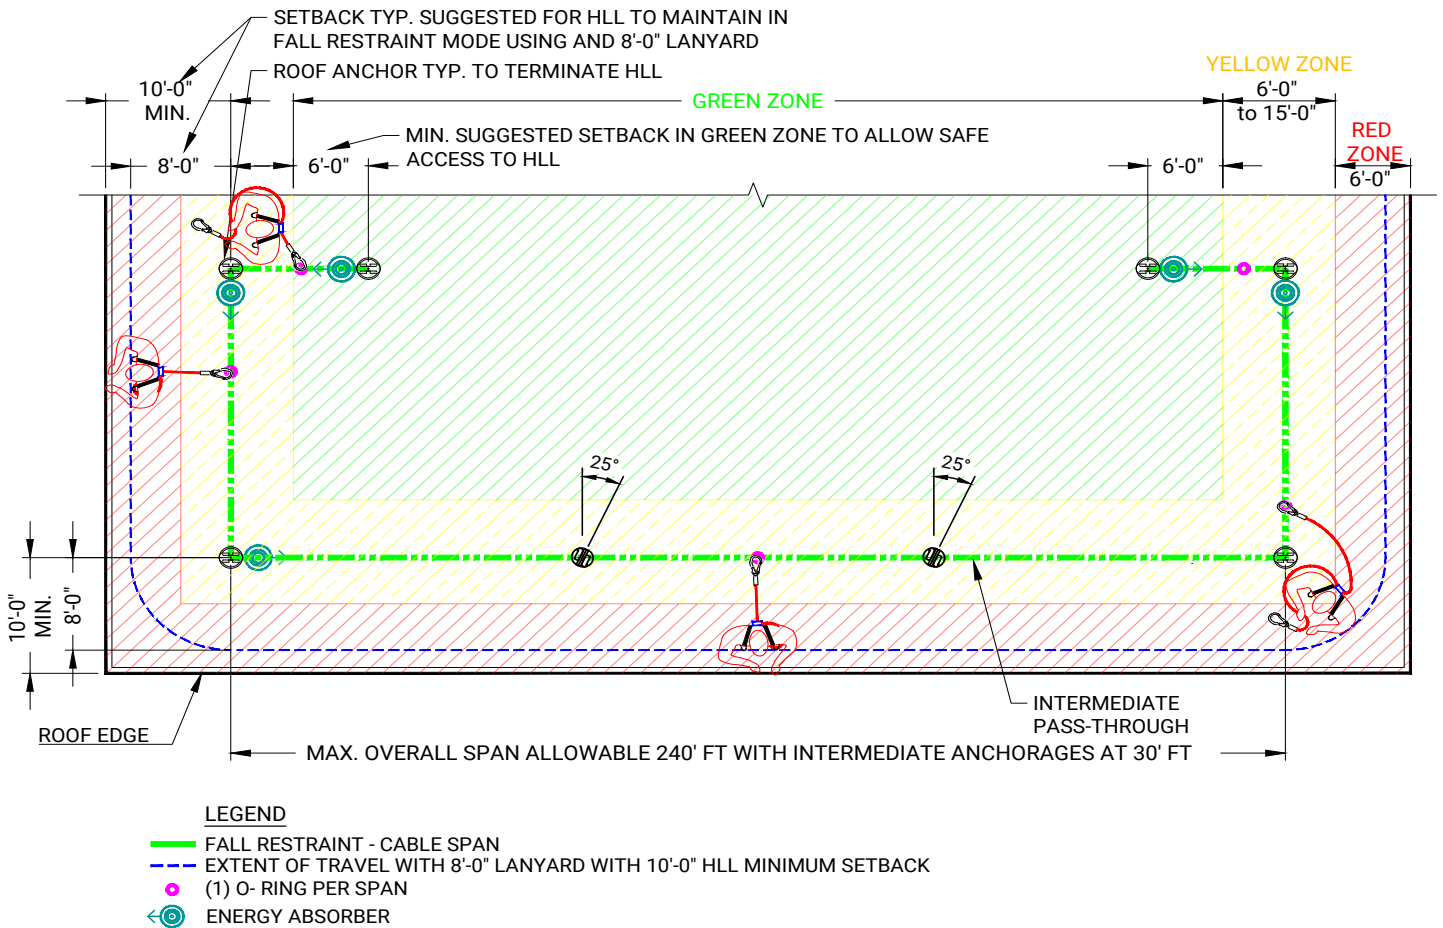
plan view with pass-through anchor eyes using a double lanyard system.
